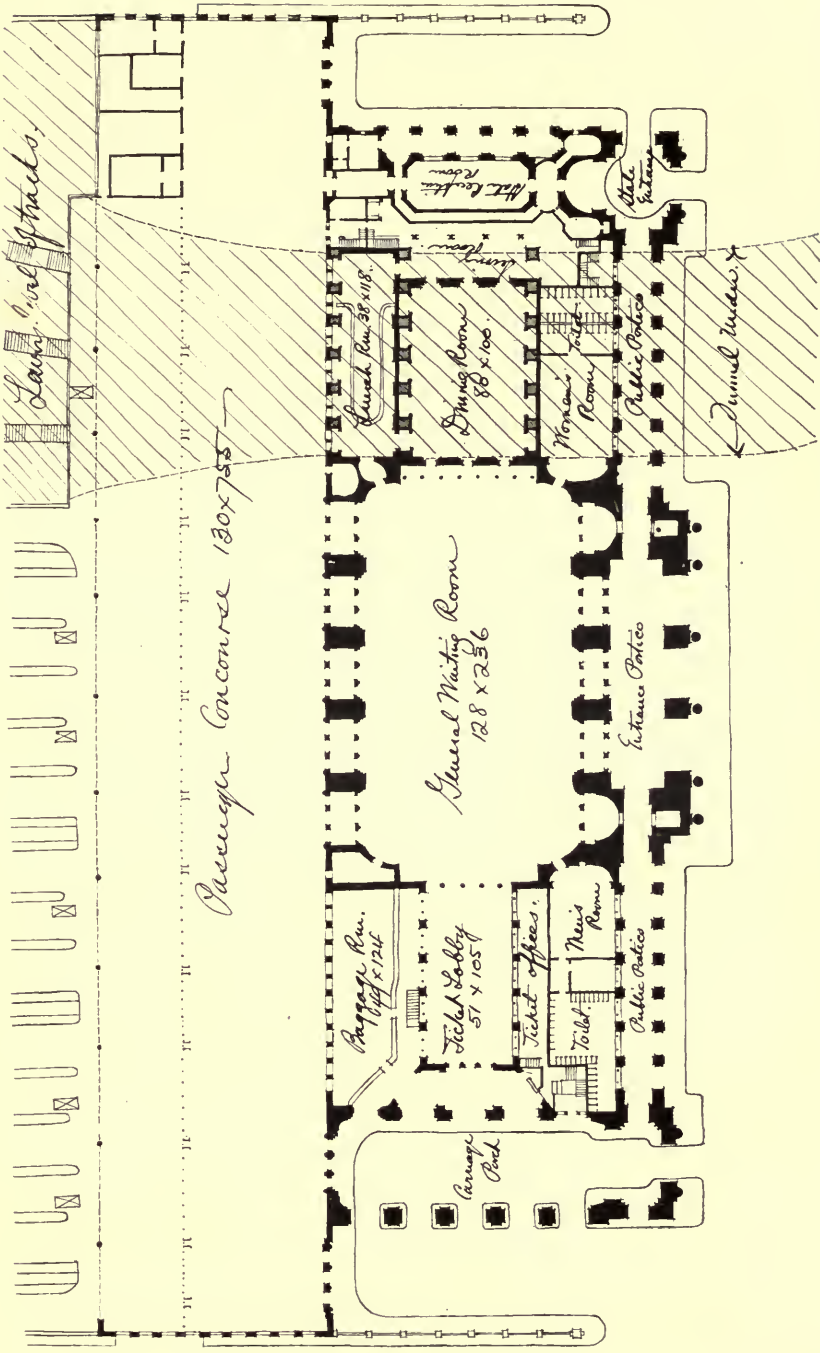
PLAN OF THE WASHINGTON TERMINAL. D. H. Burnham & Co., Architects.
